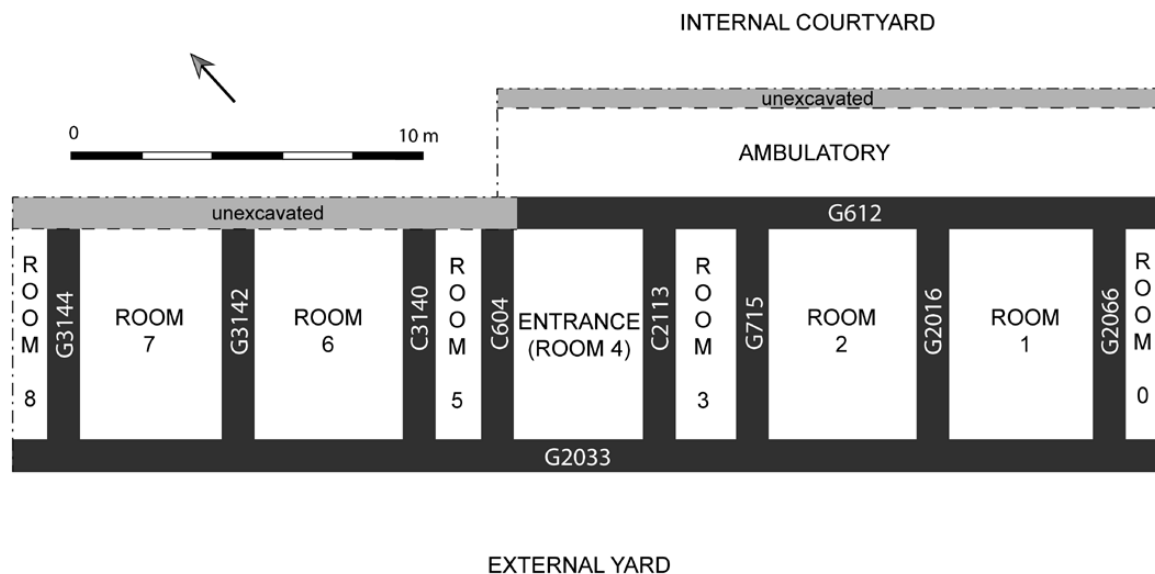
Schematic plan of the excavated front range of the Priory Field store building, showing wall Contexts and Groups
